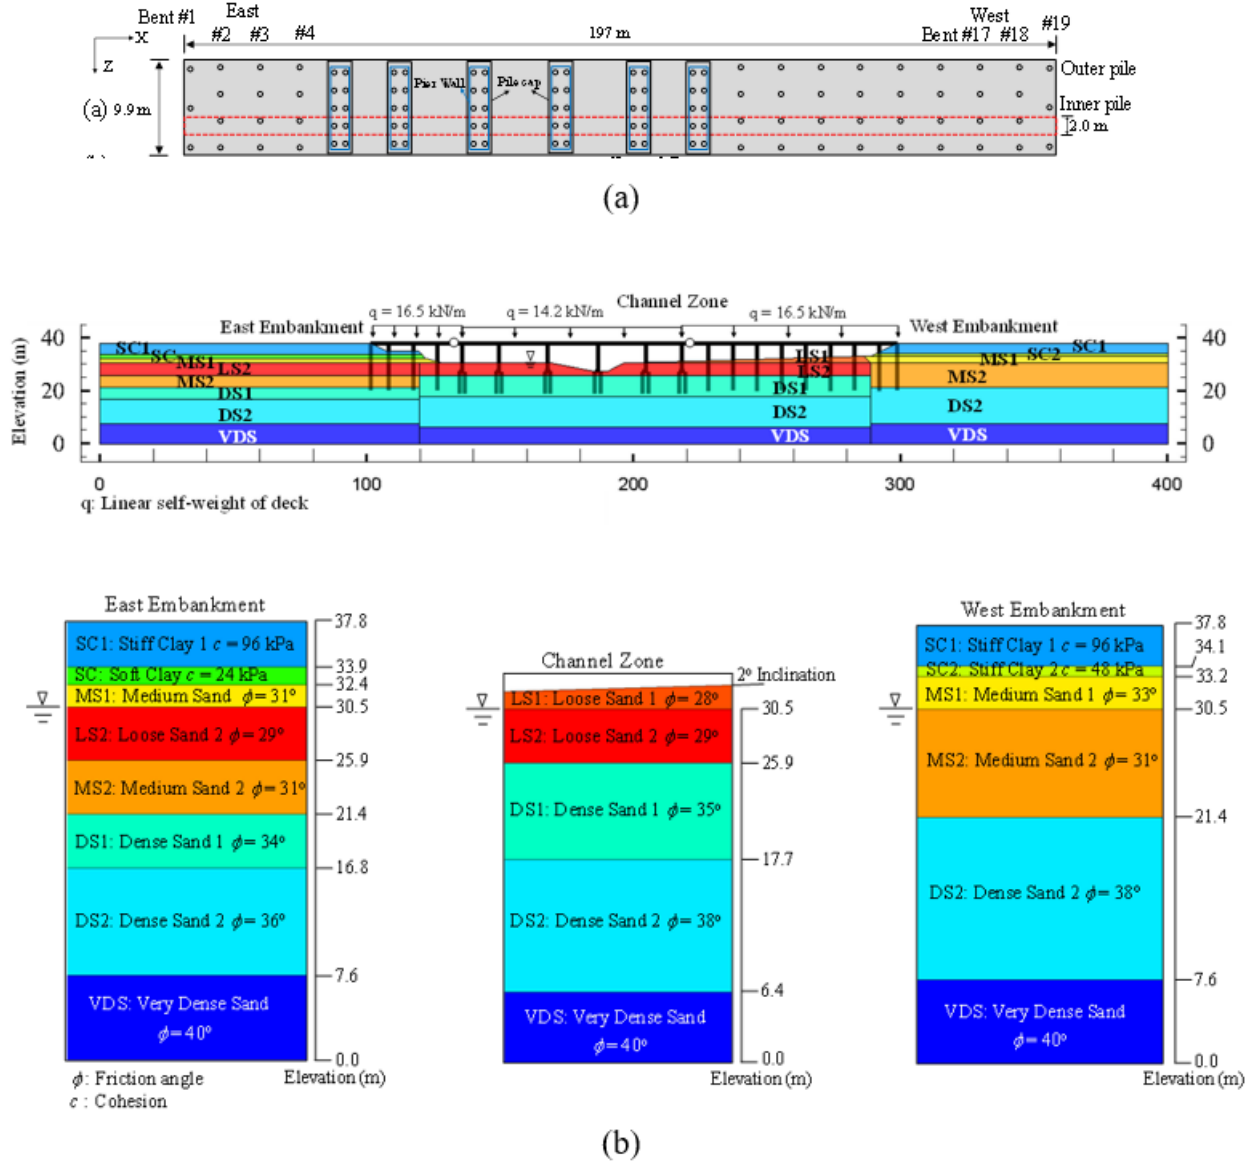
Bridge-ground system: (a) Schematic plan view of the bridge (not to scale); (b) Bridge-Ground configuration.
